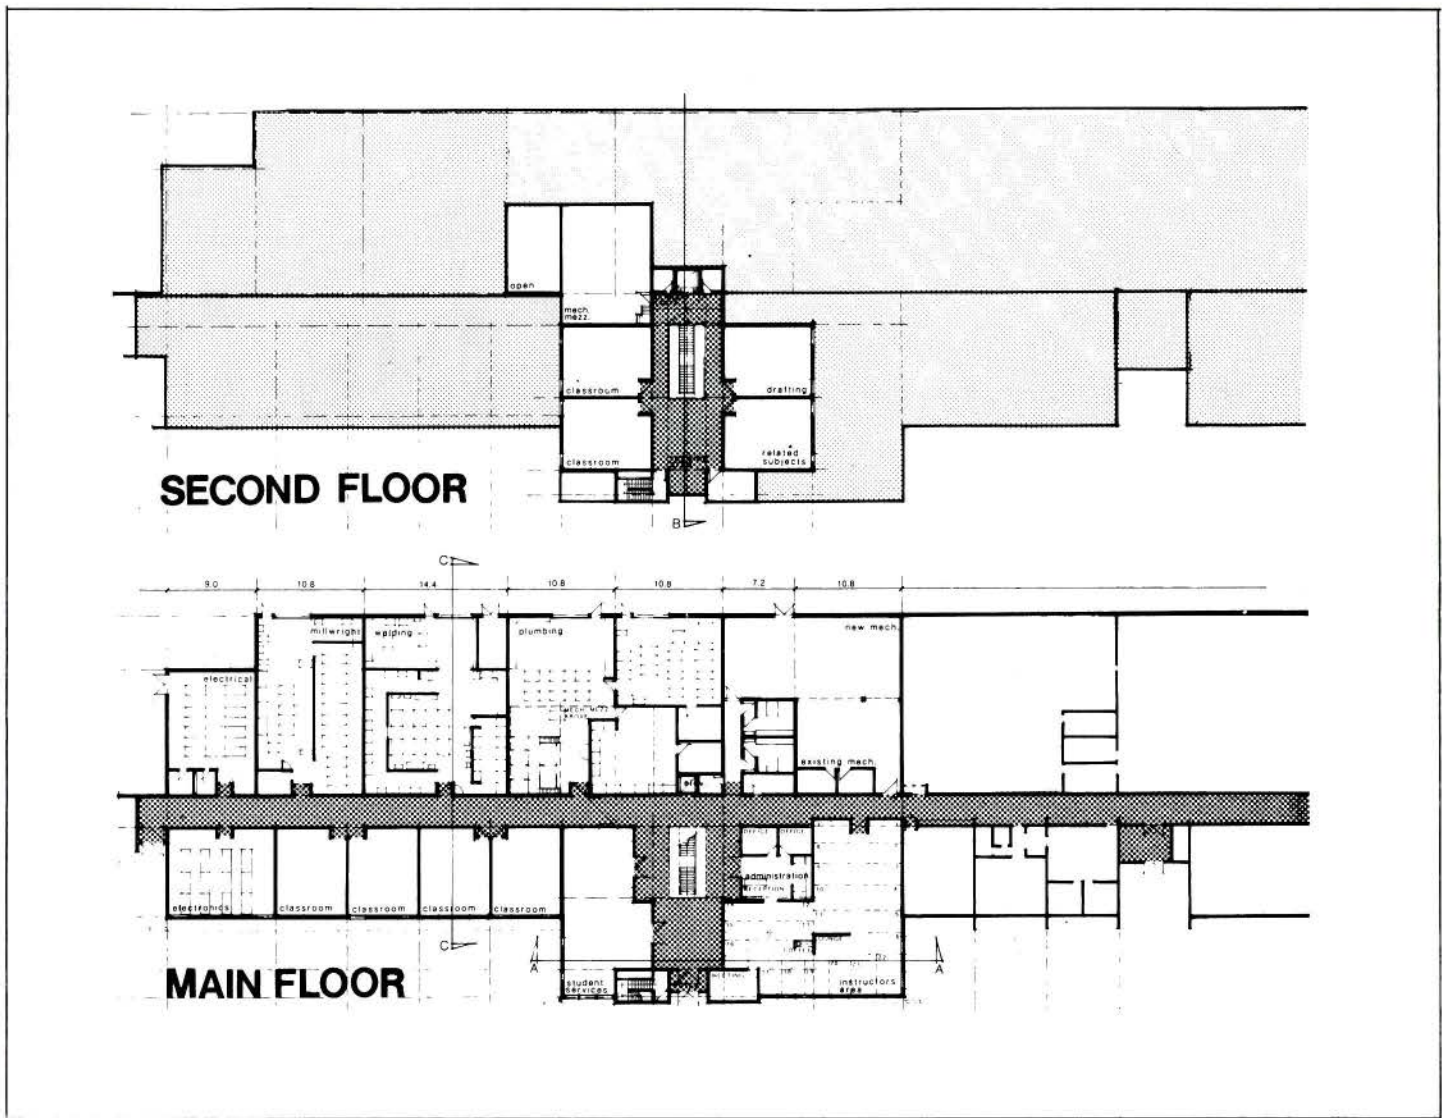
Thebacha College Trades Complex, Fort Smith, NWT (1984). Floor plan.
